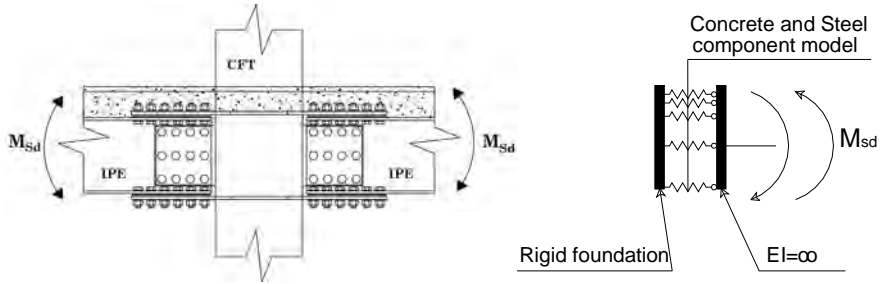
Mechanical model of a steel-concrete composite interior joint.
